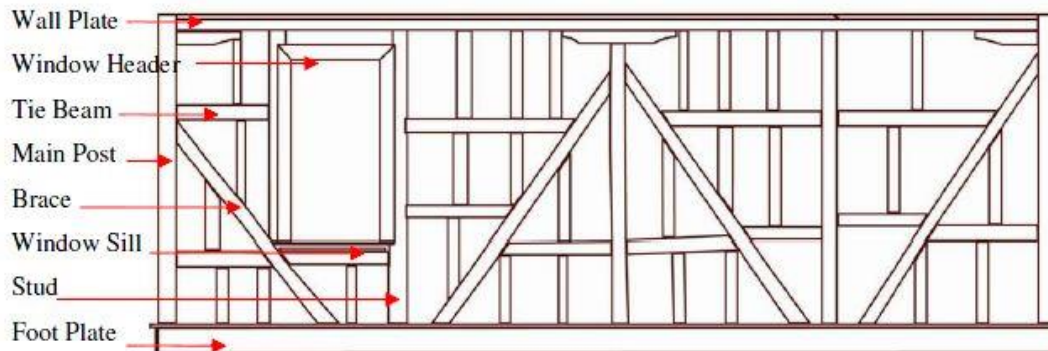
Detail of timber framed construction on Hisar Evi ,in Taraklı
